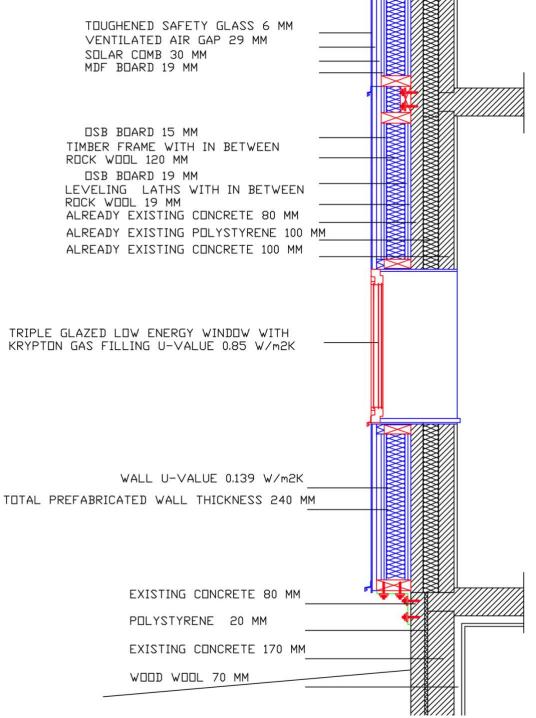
Detail drawing of the Multi-active Prefabricated facade attached onto the existing building facade with the materials labelling and the U-value of the window and facade.
